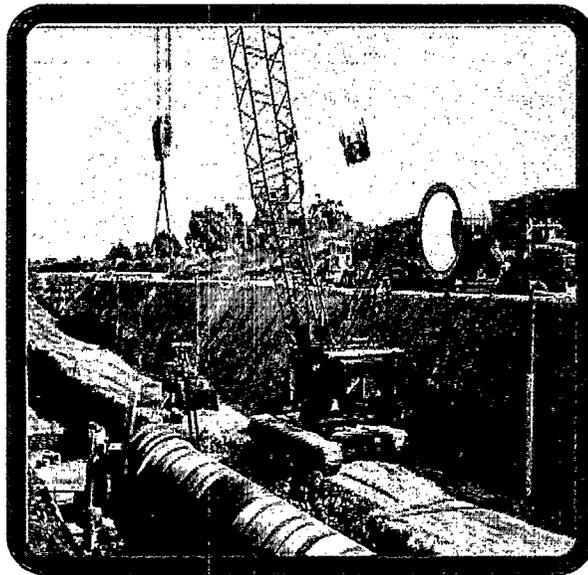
Installation of the 12 Foot Diameter Outfall for IWTP.
